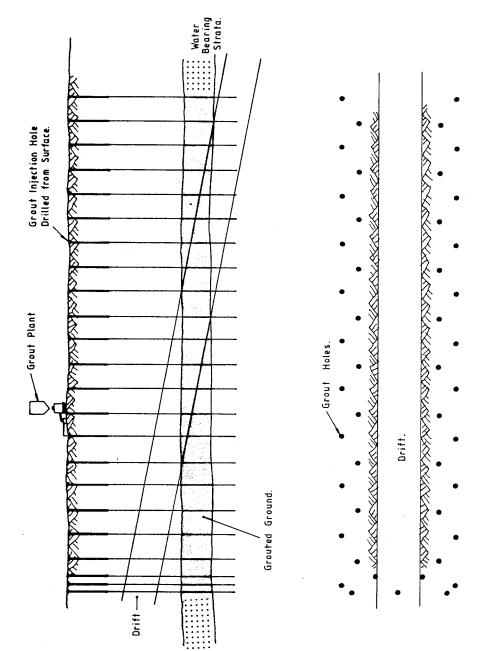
Typical Arrangement for Pregrouting from Surface - Drifts & Tunnels.
